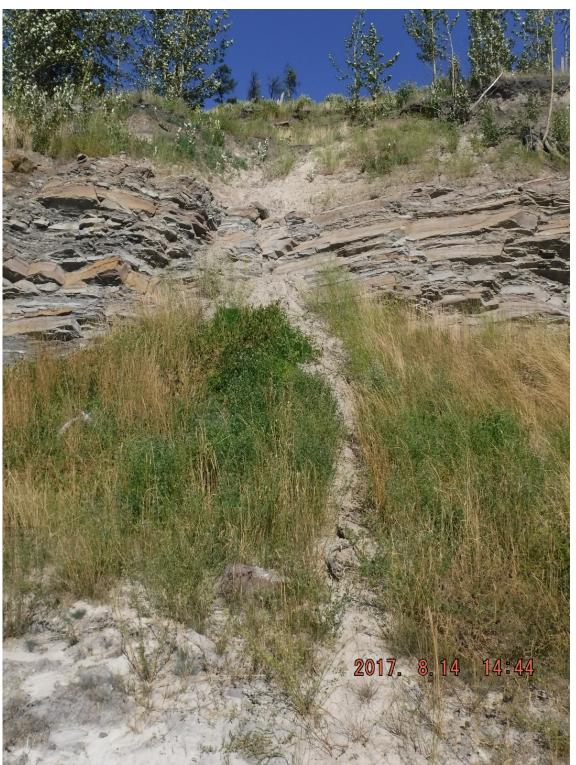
Downstream slope – looking southwest. No sign of erosion or significant movement (SNTD-2017-03)
